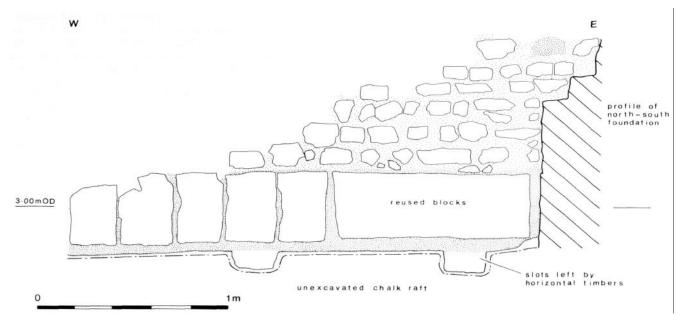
Sunlight Wharf; elevation of the northern face of the monumental masonry foundation in Trench BX. (1:20)
